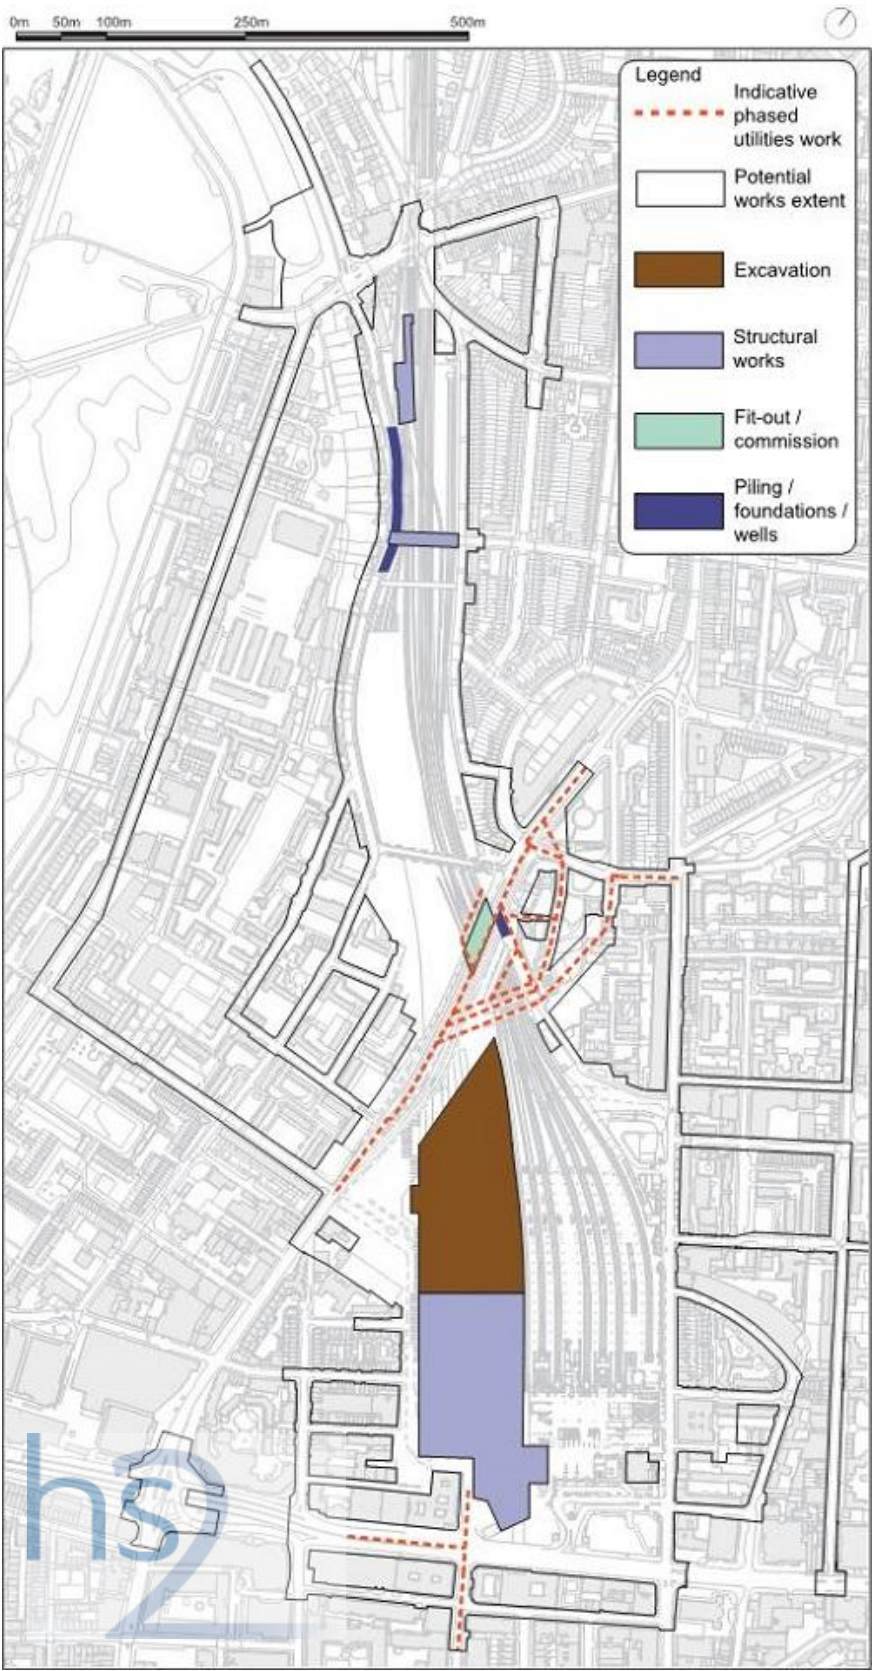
2020 demolition, excavation, piling/foundation, structural and fit-out works and tunnel boring machine activity
